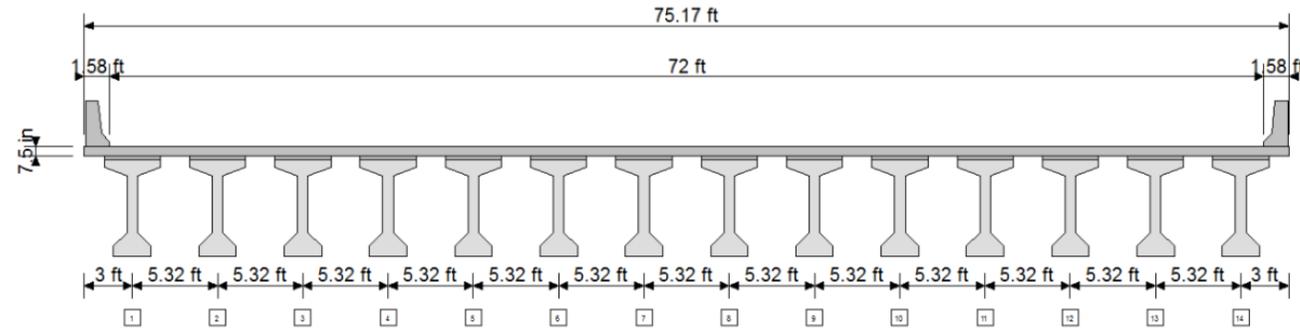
SR30 over MC85 - Typical Section (AASHTO Type VI)
